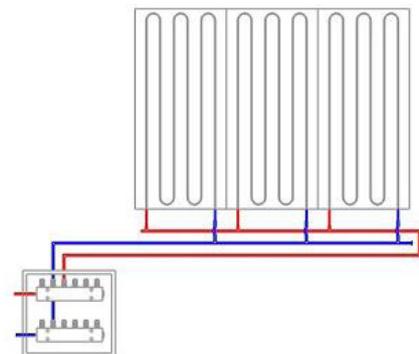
Modular hybrid wall installation design (Koca et al, 2014).
